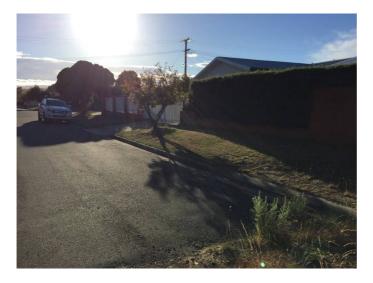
Looking East from Negara Street West (Sth side of road kerbside)
